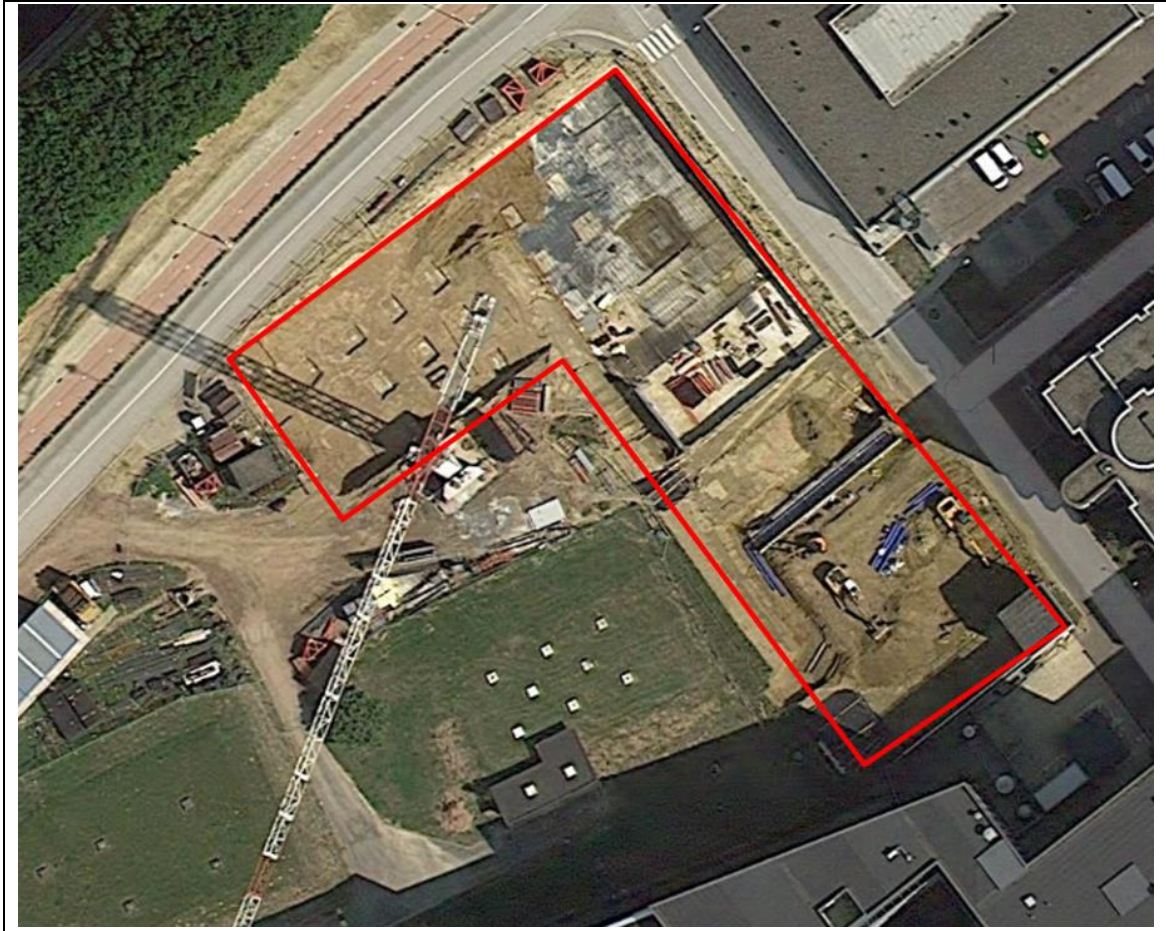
Aerial view of the construction site during the execution of the foundation works (Google view in July 2013)
